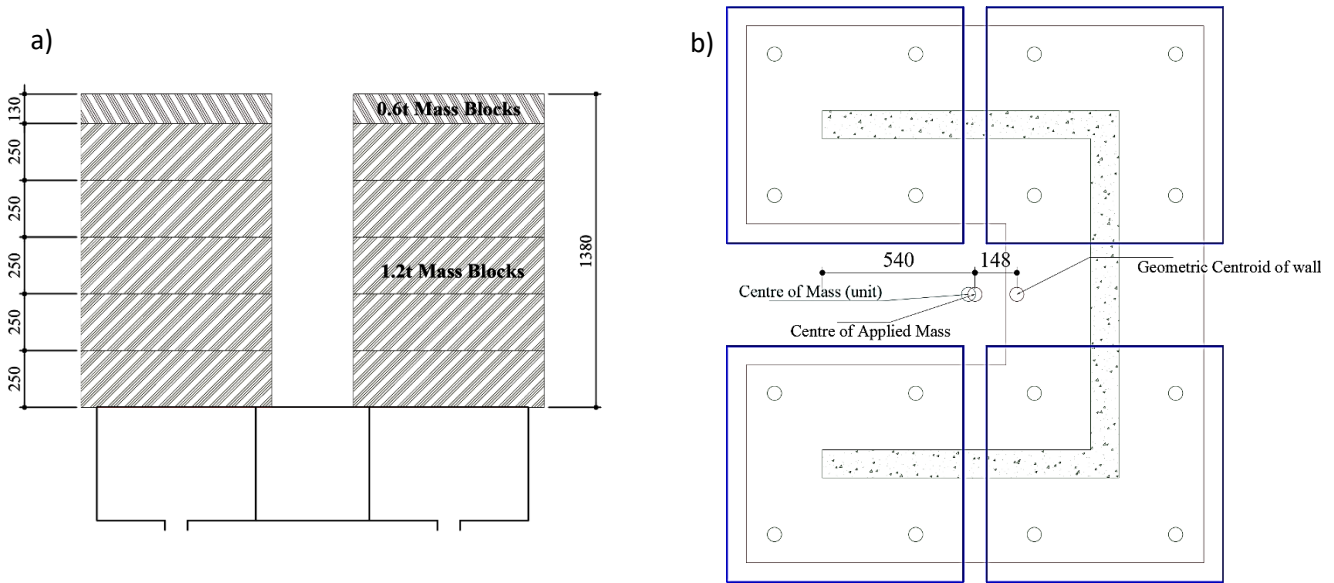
Location of the applied mass blocks for UWS1 (a) elevation-front view above the wall collar (b) plan view above the wall collar with the 4 regions in blue indicating the mass blocks
